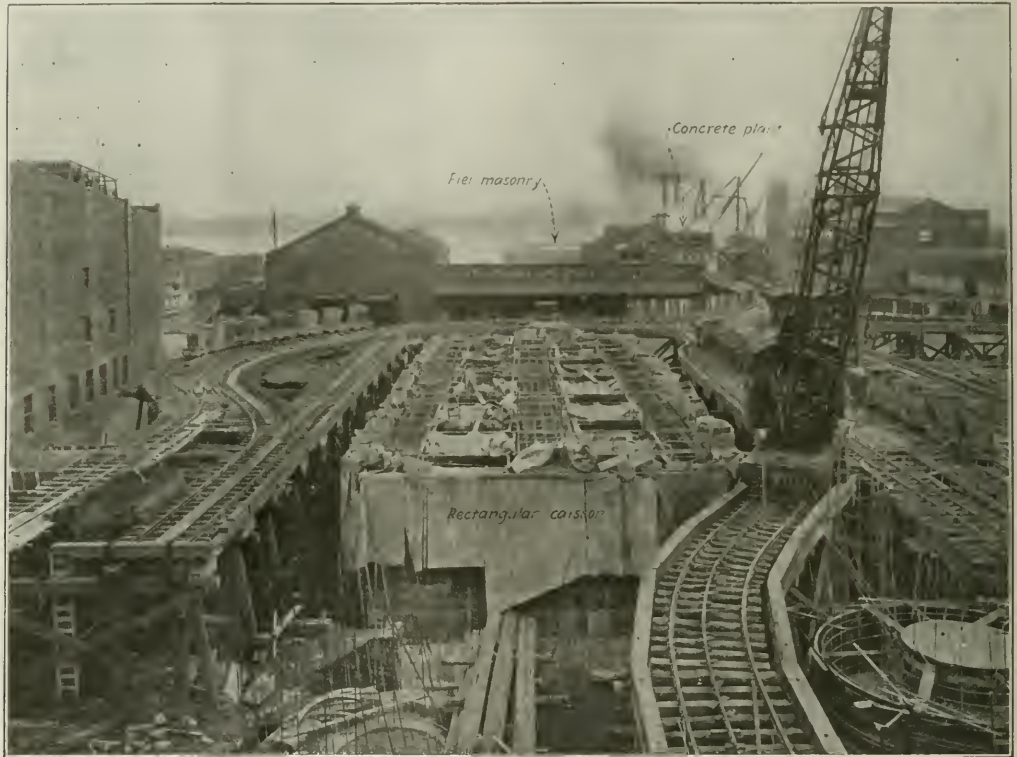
PHILADELPHIA ANCHORAGE, NORTH CAISSONS, LOOKING EAST
